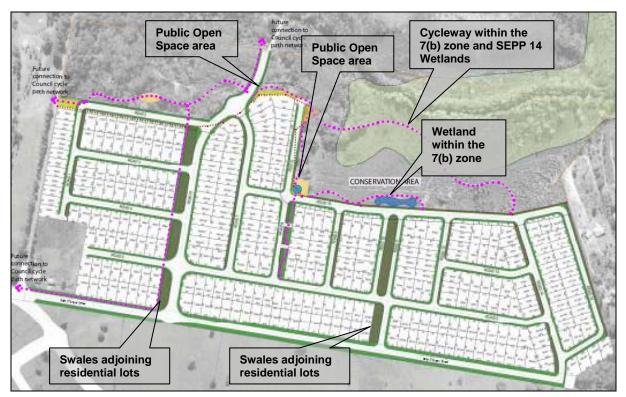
Subdivision Layout as Originally Proposed (source: Environmental Assessment)
